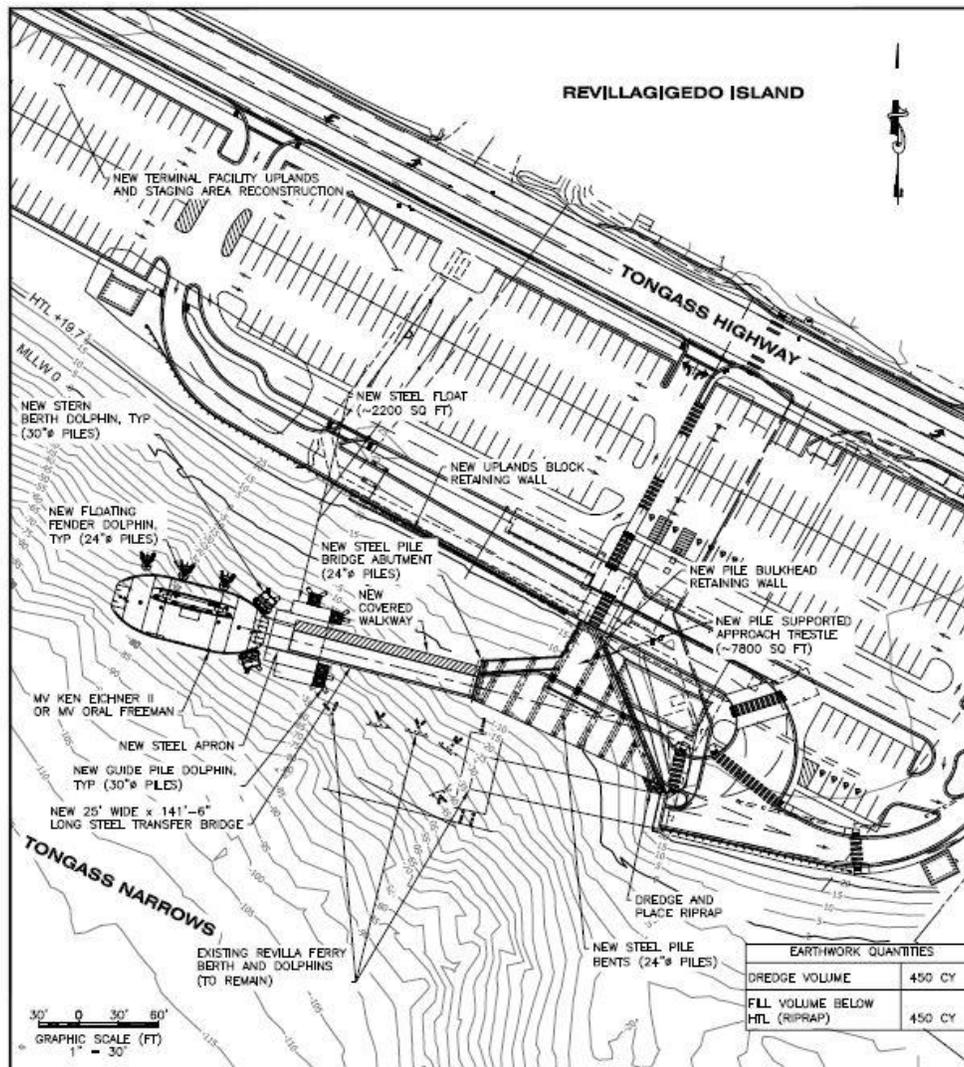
Site plan for the proposed new Revillagigedo Island Airport Shuttle Ferry Berth (HDR 2023).
